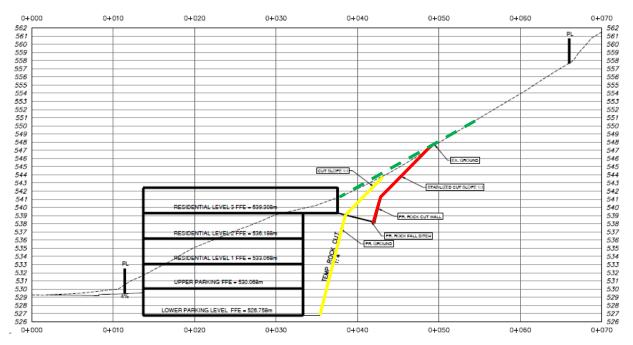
Cross section of a portion of the building showing one of the proposed rock cuts (red line), temporary rock cut (yellow line) and existing ground (green dashed line) at the rear. Rock cut would require mechanical stabilization (wire mesh) as recommended in the geotechnical report.
